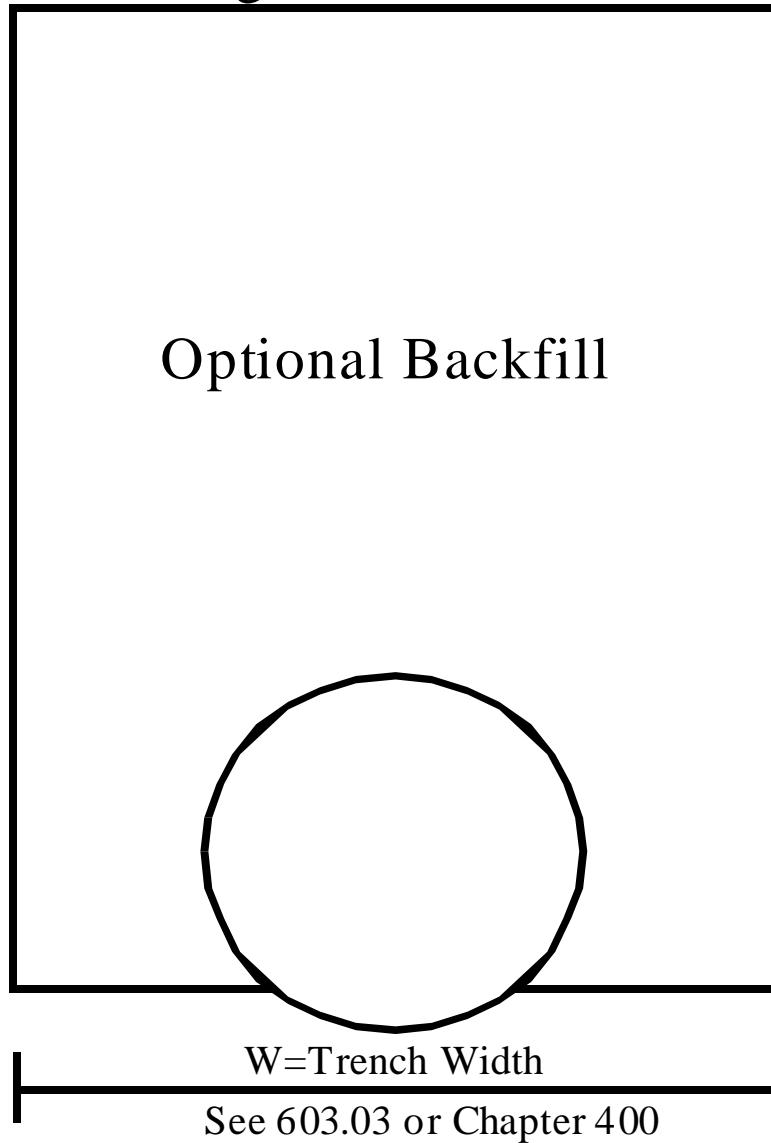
Backfill for Type D & F Conduits in a Cut or Fill
